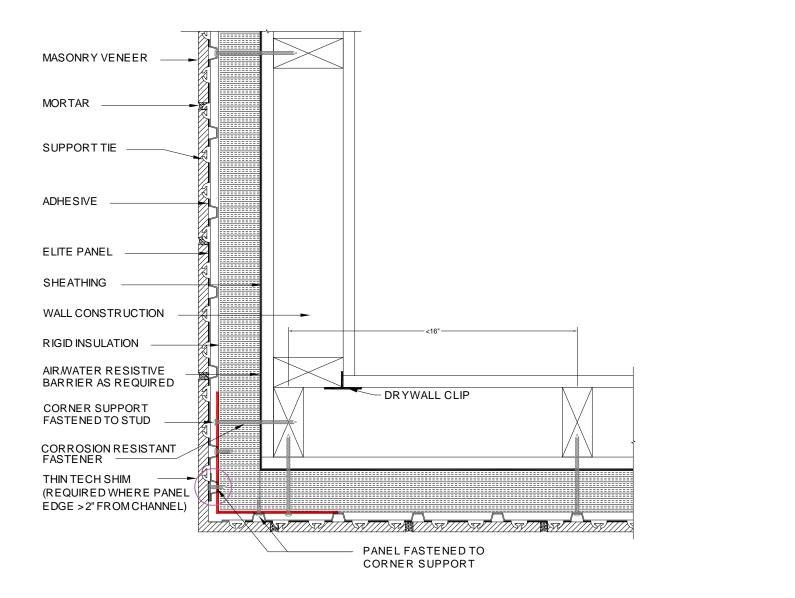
CORNER SUPPORT ON 2 STUD CORNER WITH 2 IN. INSULATION AND THIN TECH SHIM ADDED AS SUPPORT
